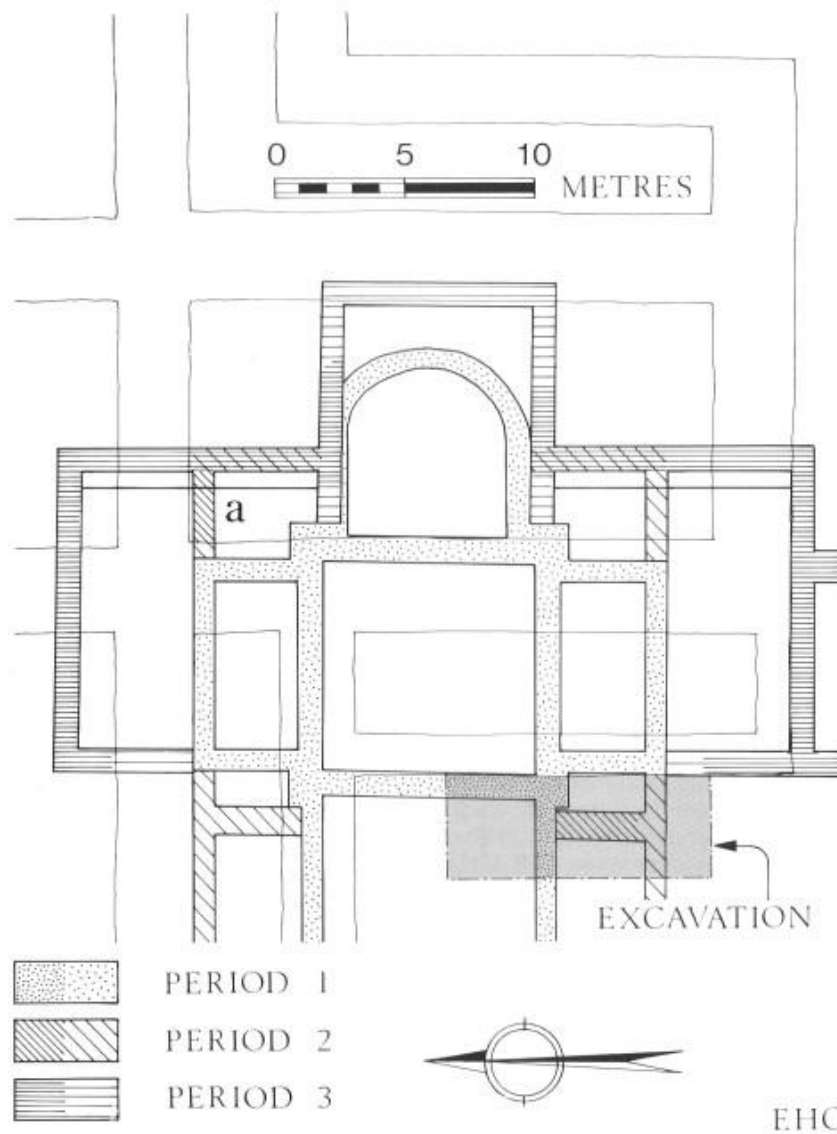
B The east end of the earliest monastic church in Peterborough: the conjectural plan (excavation area shown by grey tone)
